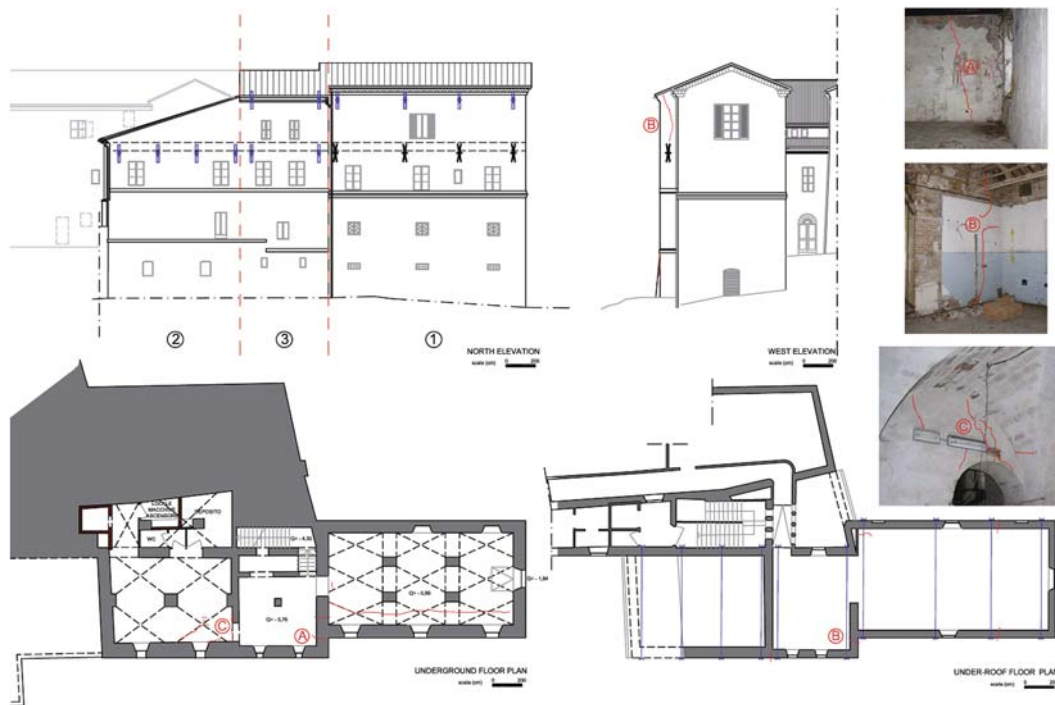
A complex historic building damaged by the earthquake: crack pattern and provisional intervention on the North facade.
